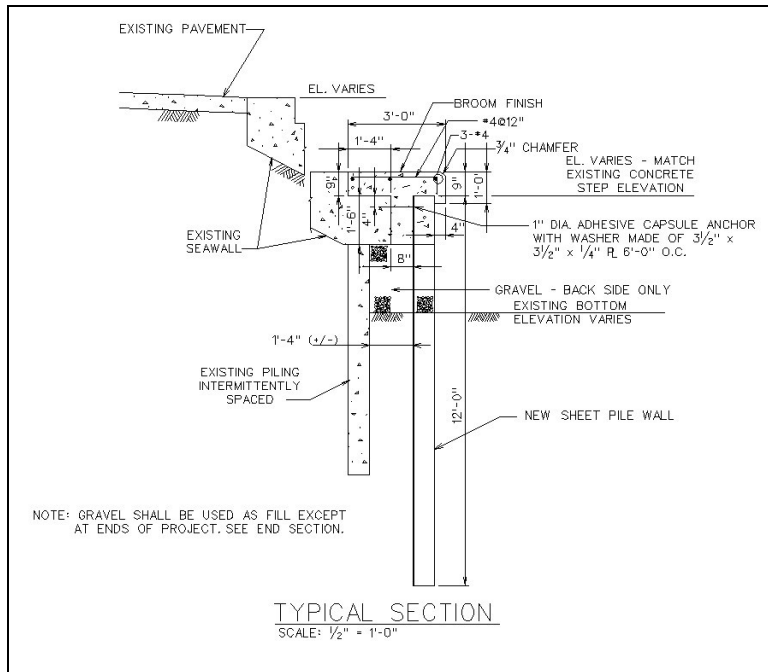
Cross-Section of Proposed Clermont Harbor Work
